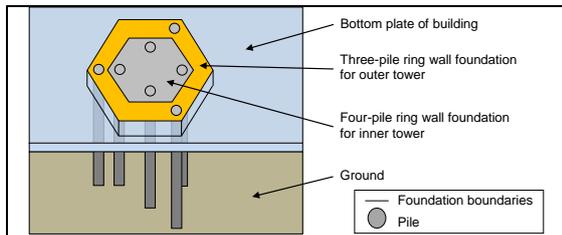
Schematic of the Einstein-Elevator's foundation, indicating arrangement and shape of the ring wall foundations of the two towers (source: ITA and EHS)
